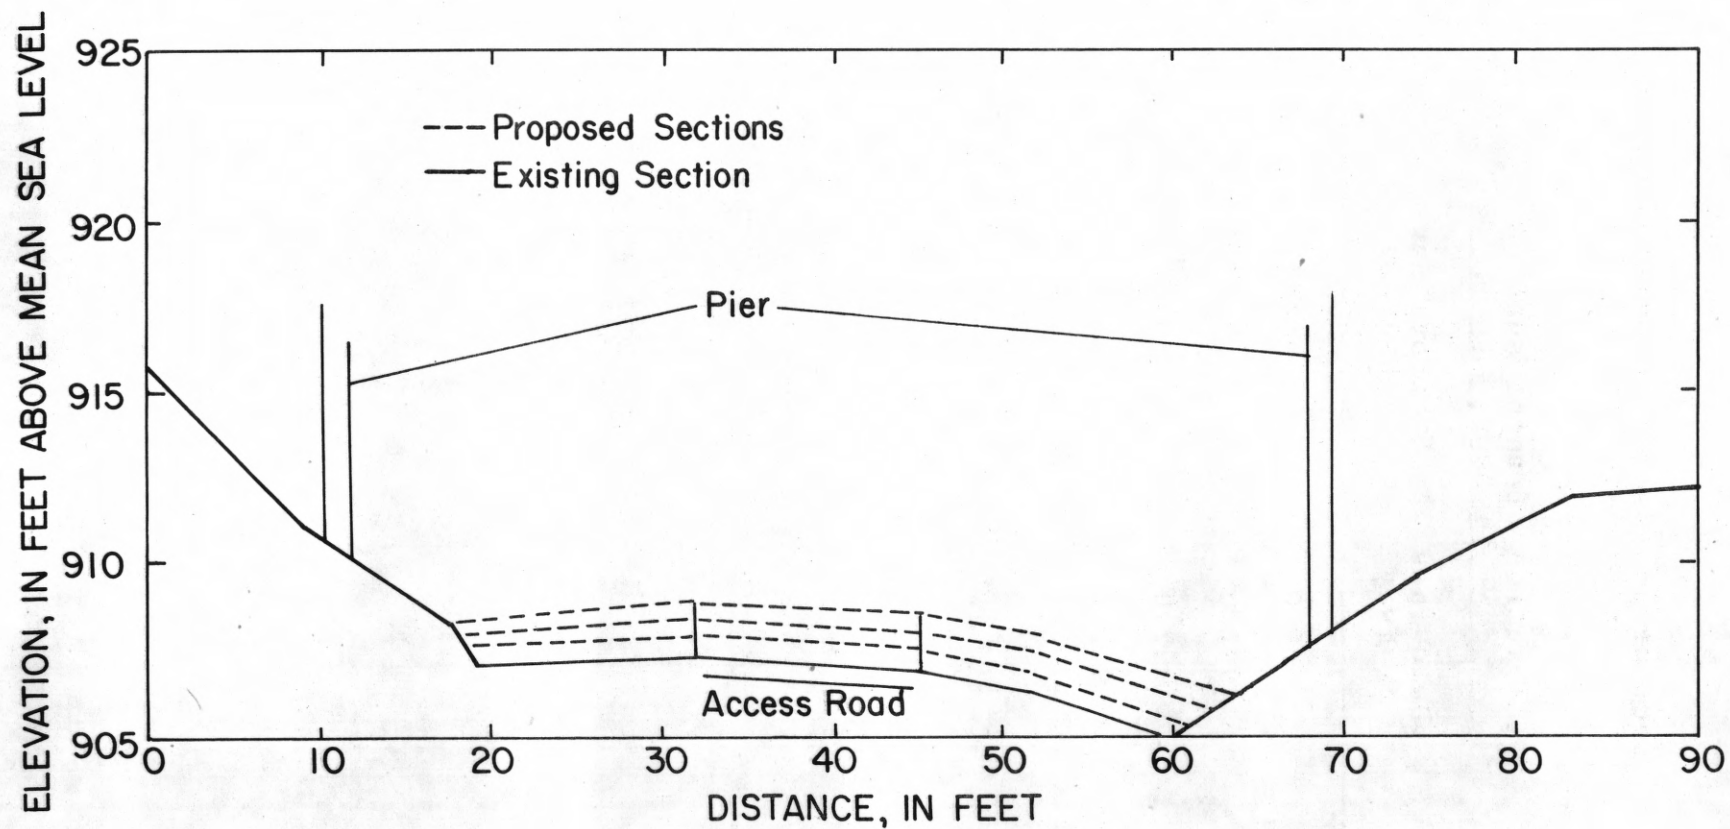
ACCESS ROAD THROUGH NEW STATE HIGHWAY 41 EMBANKMENT.
